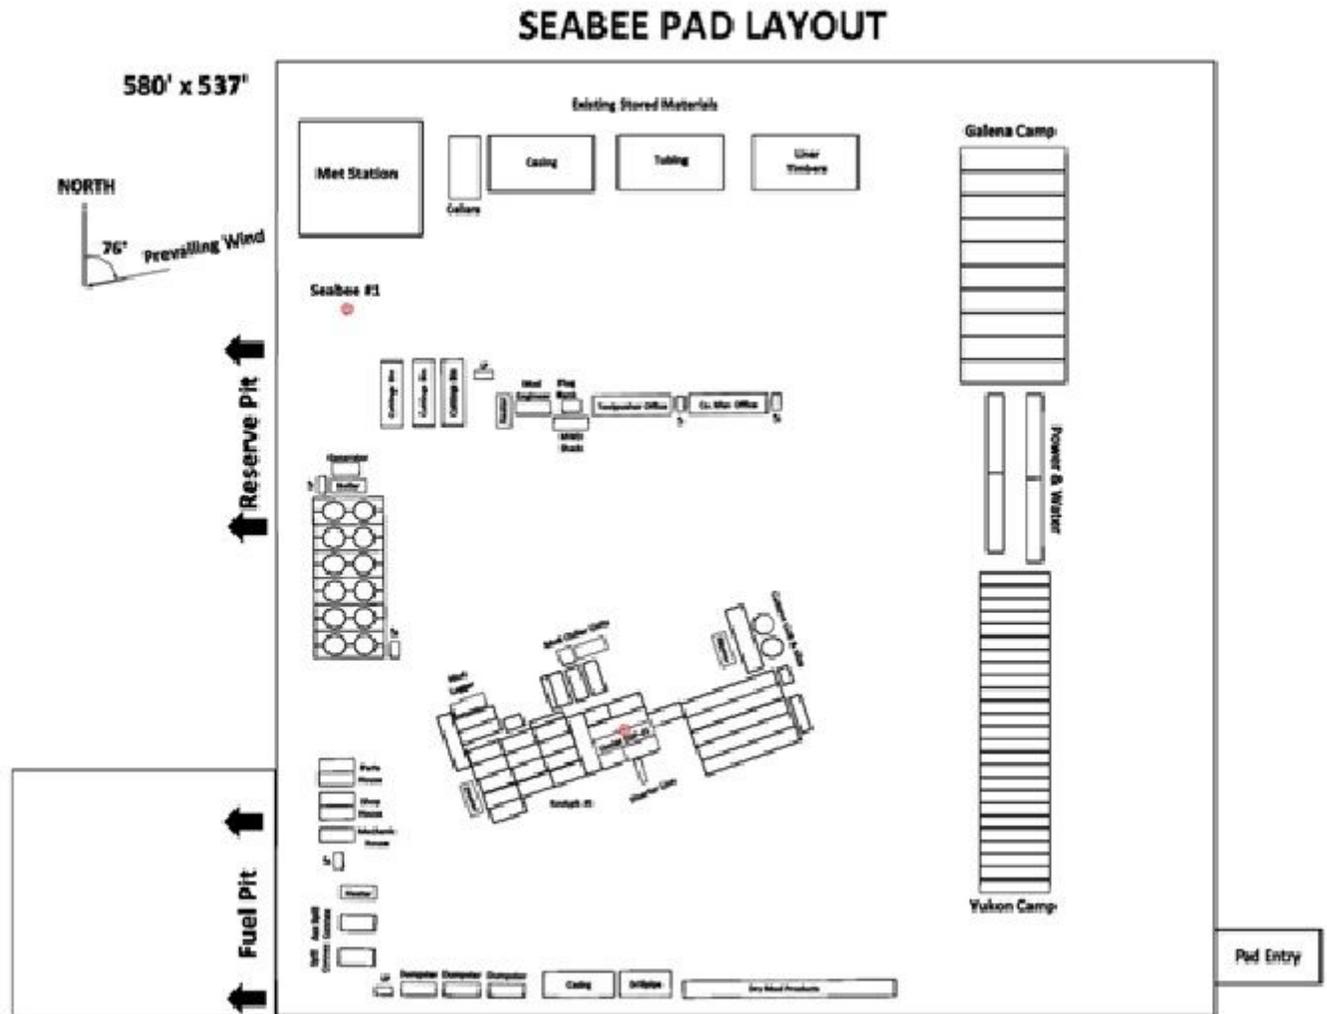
Applicant drawing of proposed Seabee Pad Layout.
